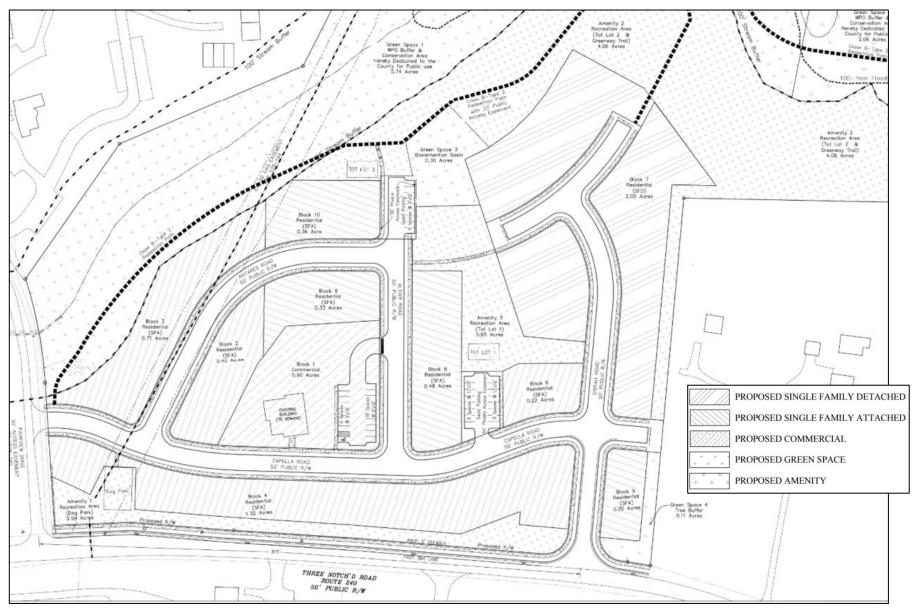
Excerpt from the approved application plan. The application plan can be referenced in its entirety in Attachment 2.
